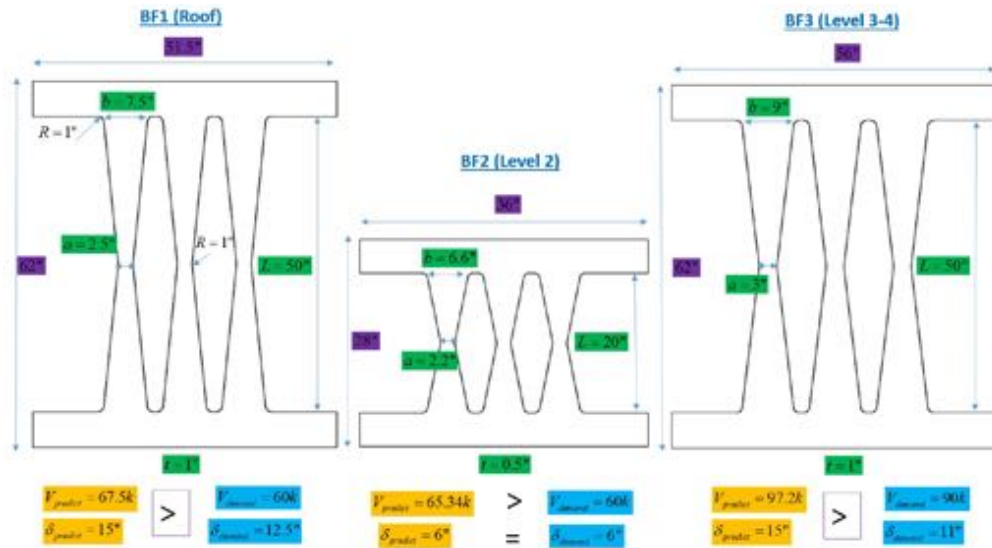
Example diaphragm fuse design for 4-story BRB building archetype
